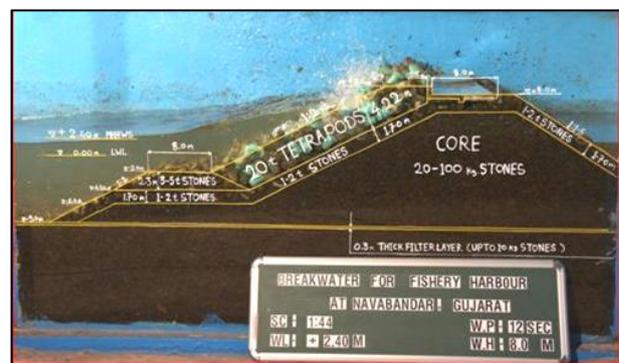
Action of 8 m waves at MHWL on armour layer of Breakwater
